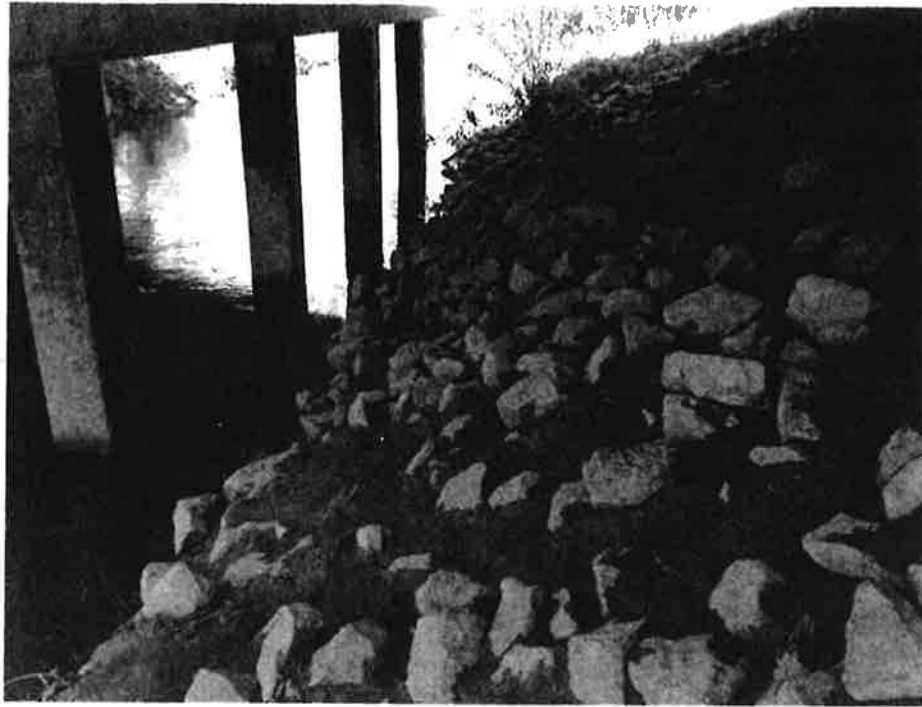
Riprap on stream bank under Bridge 2 looking upstream.
